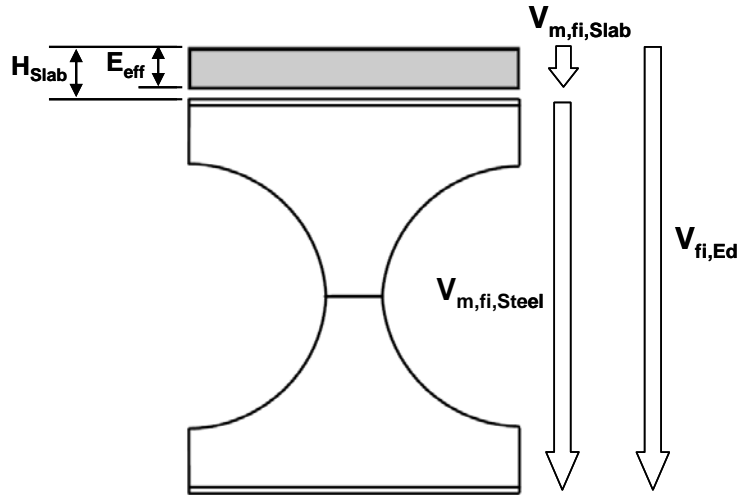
Shear force distribution between concrete slab and steel beam
